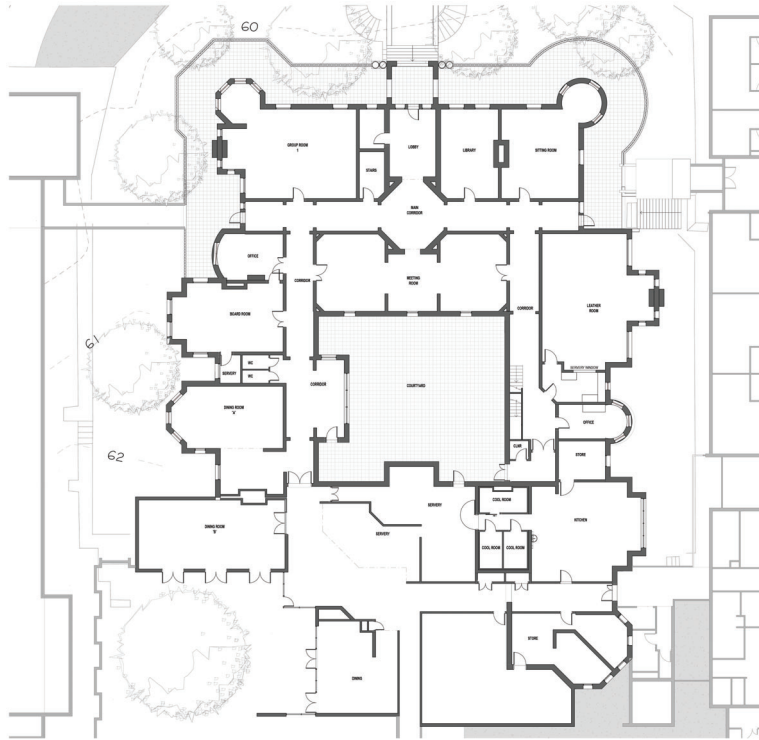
St John of God Richmond Hospital. Belmont House Existing Ground Plan. STH October 2021. Belmont House outlined in blue.
